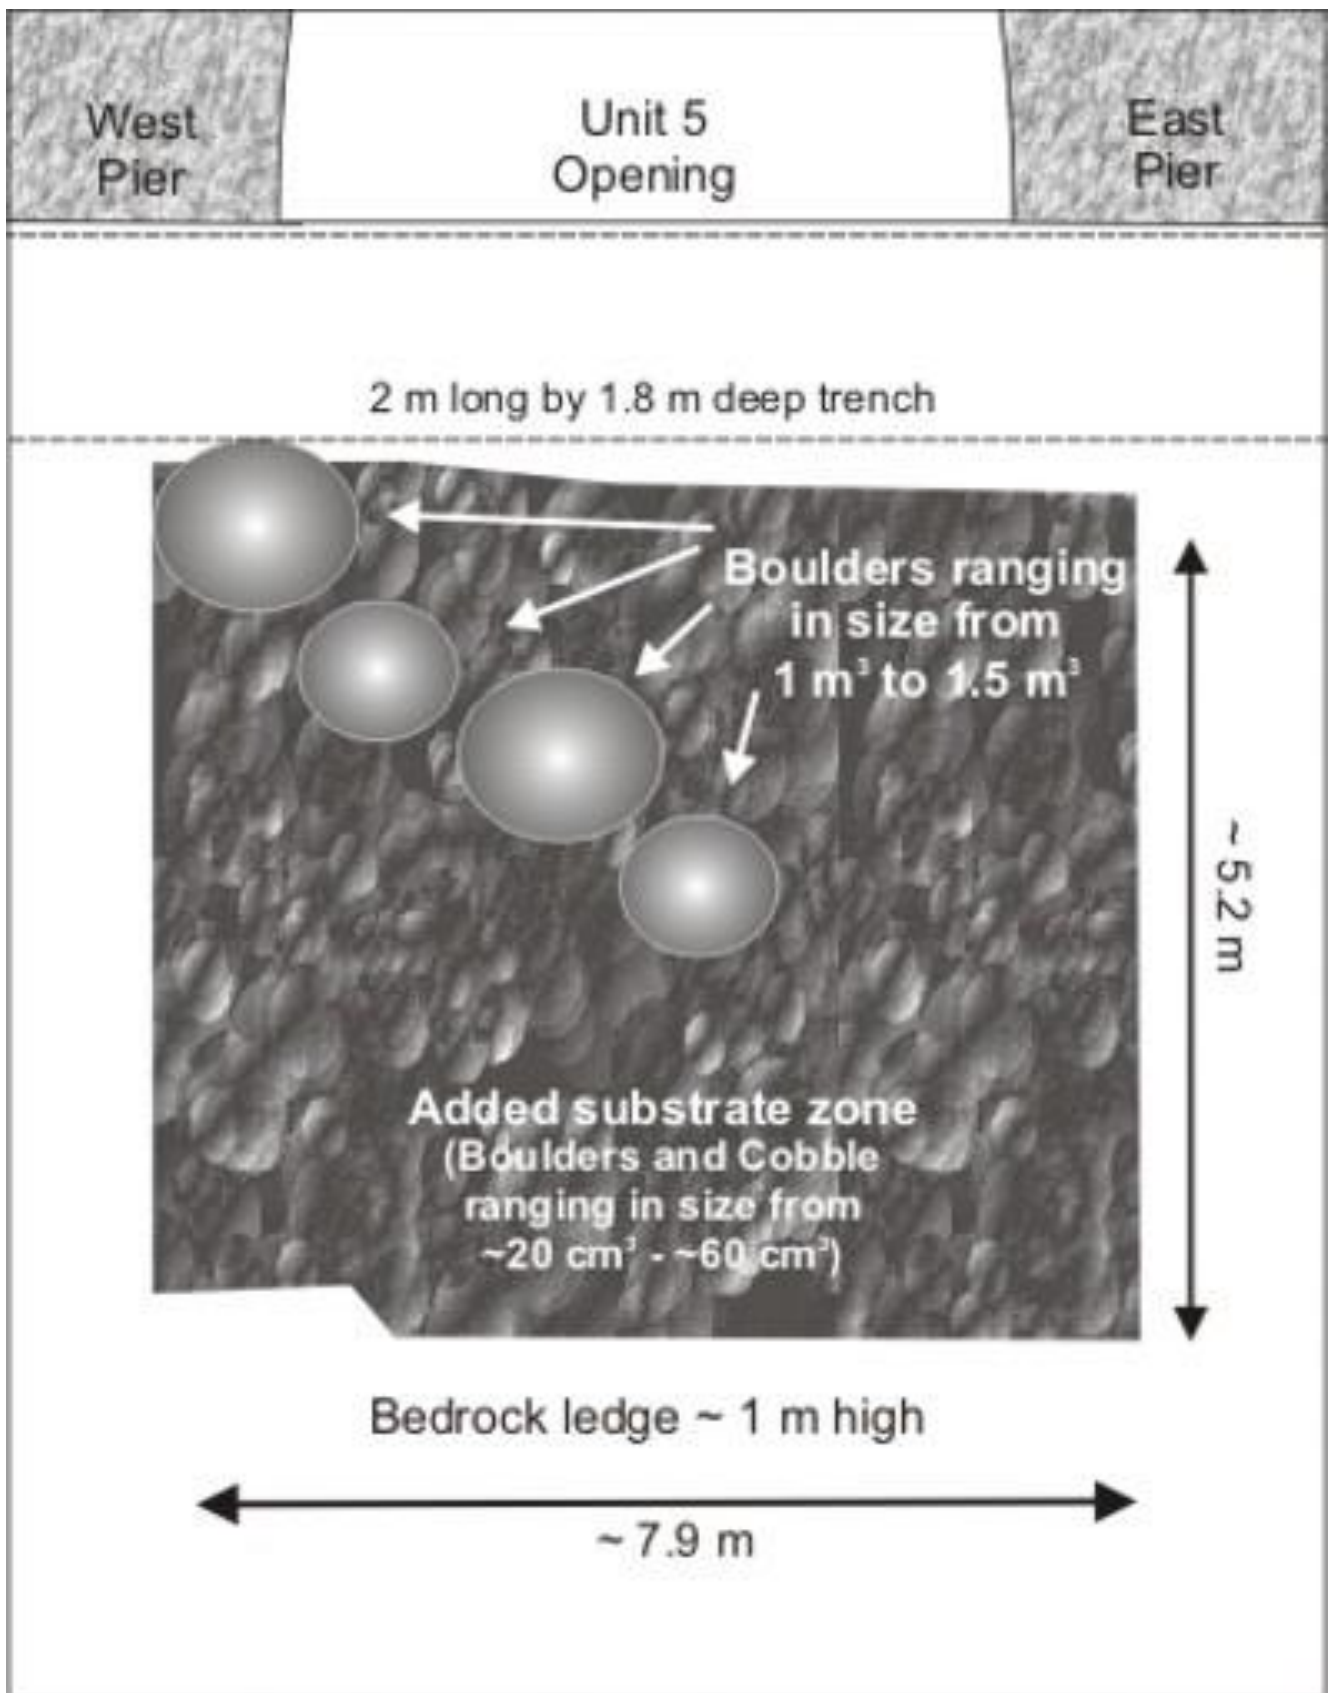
Plan view sketch of shoal constructed below Unit 5 (not to scale).
